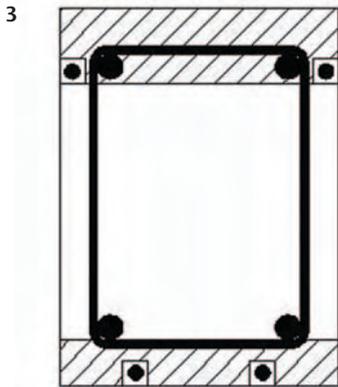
Location of failure planes in a typical section / Fig 4. Potential extension of anchorage zones to avoid separation failure
